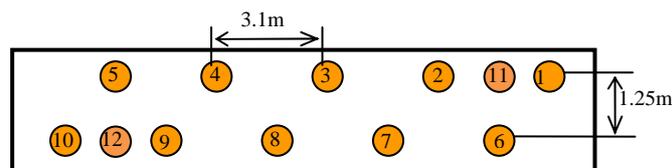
Revised Pier N2 Pile Configuration with 12 Piles
